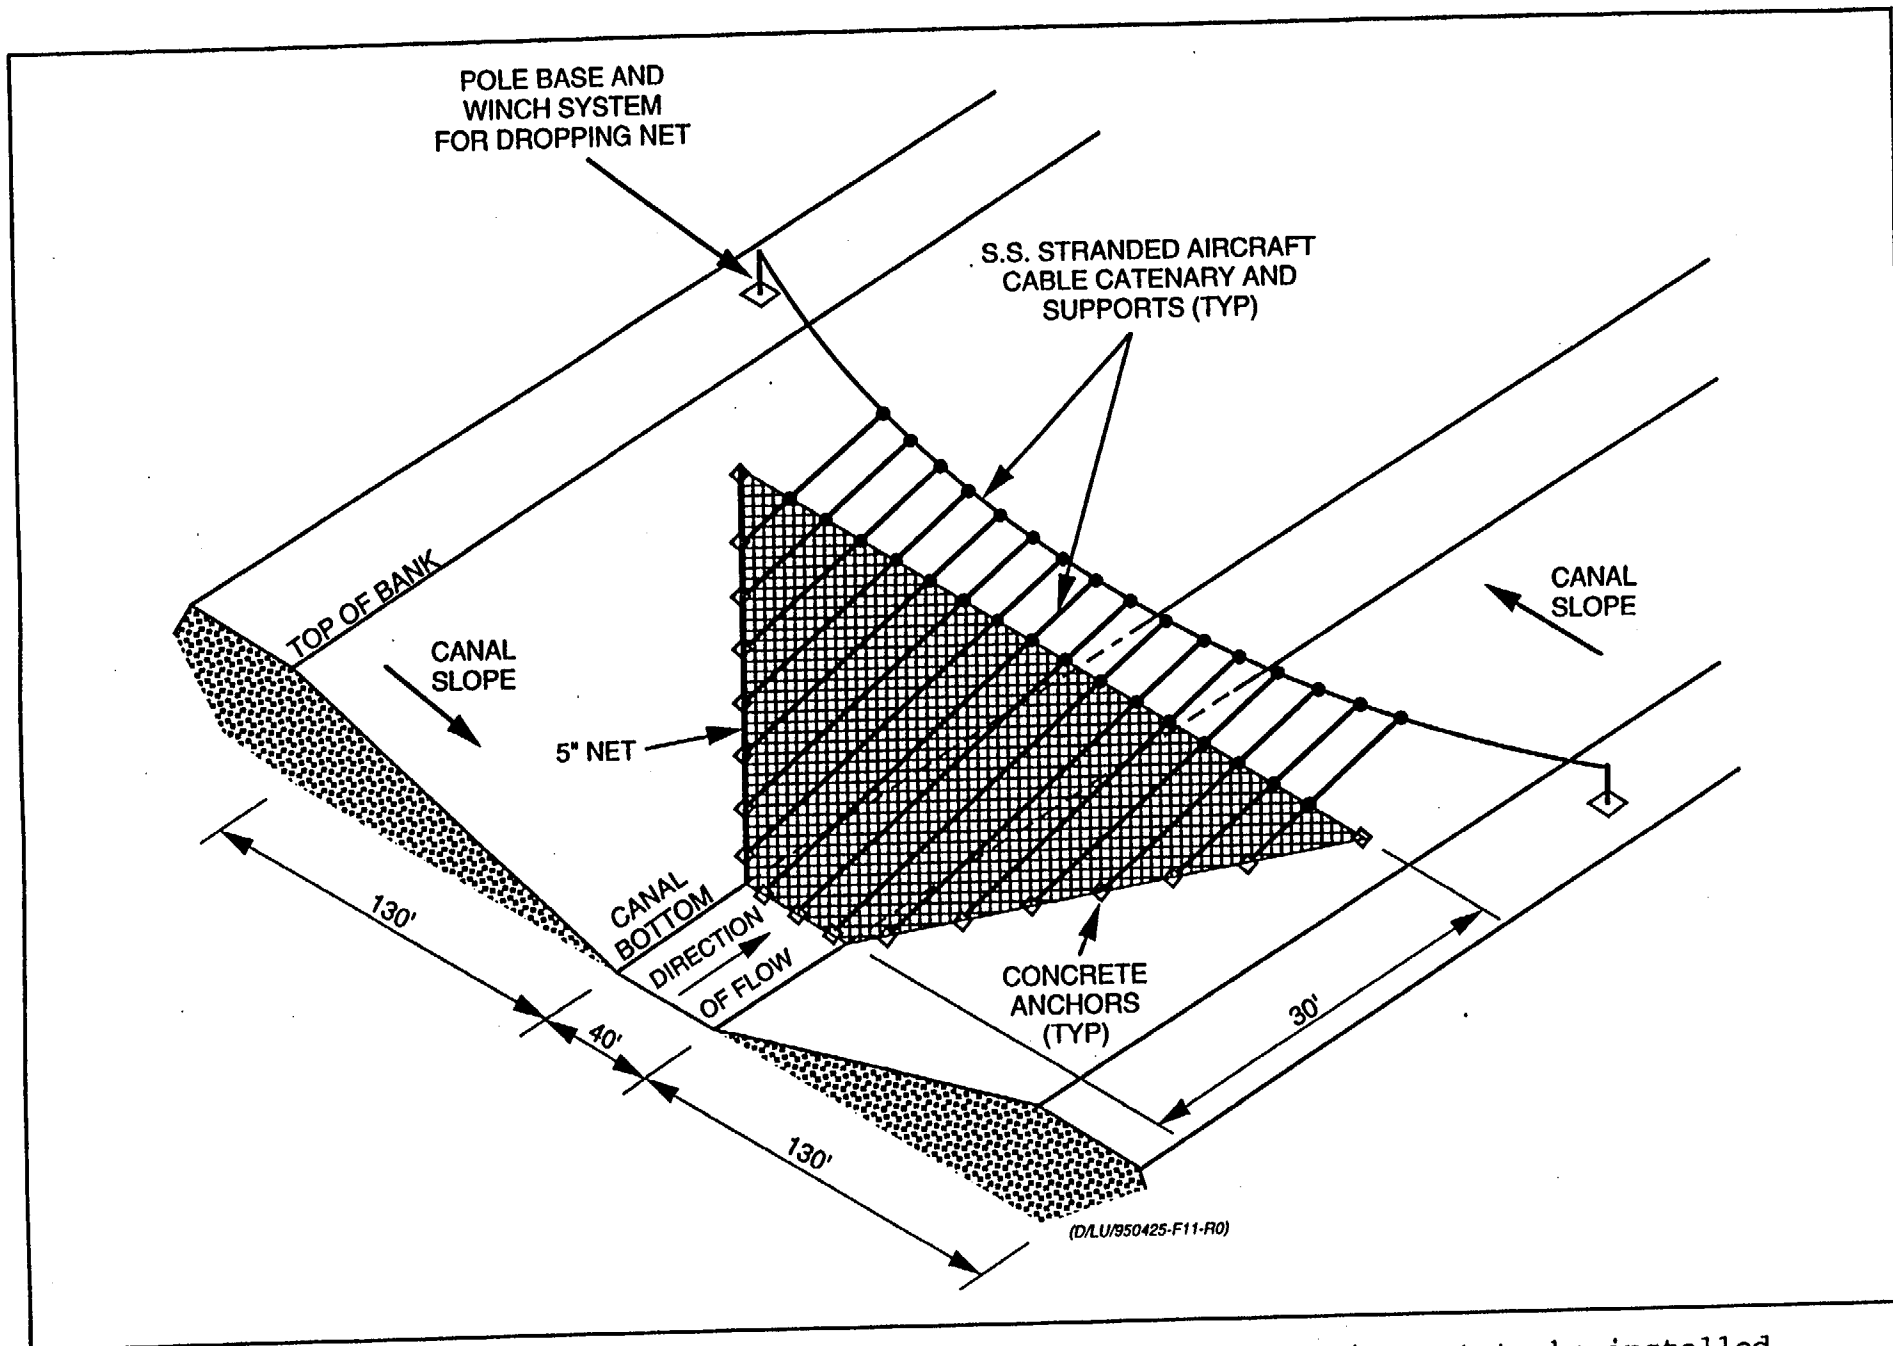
Conceptual design for a 5 inch (12.7 cm) square mesh barrier net to be installed in the intake canal of the St. Lucie Plant.
